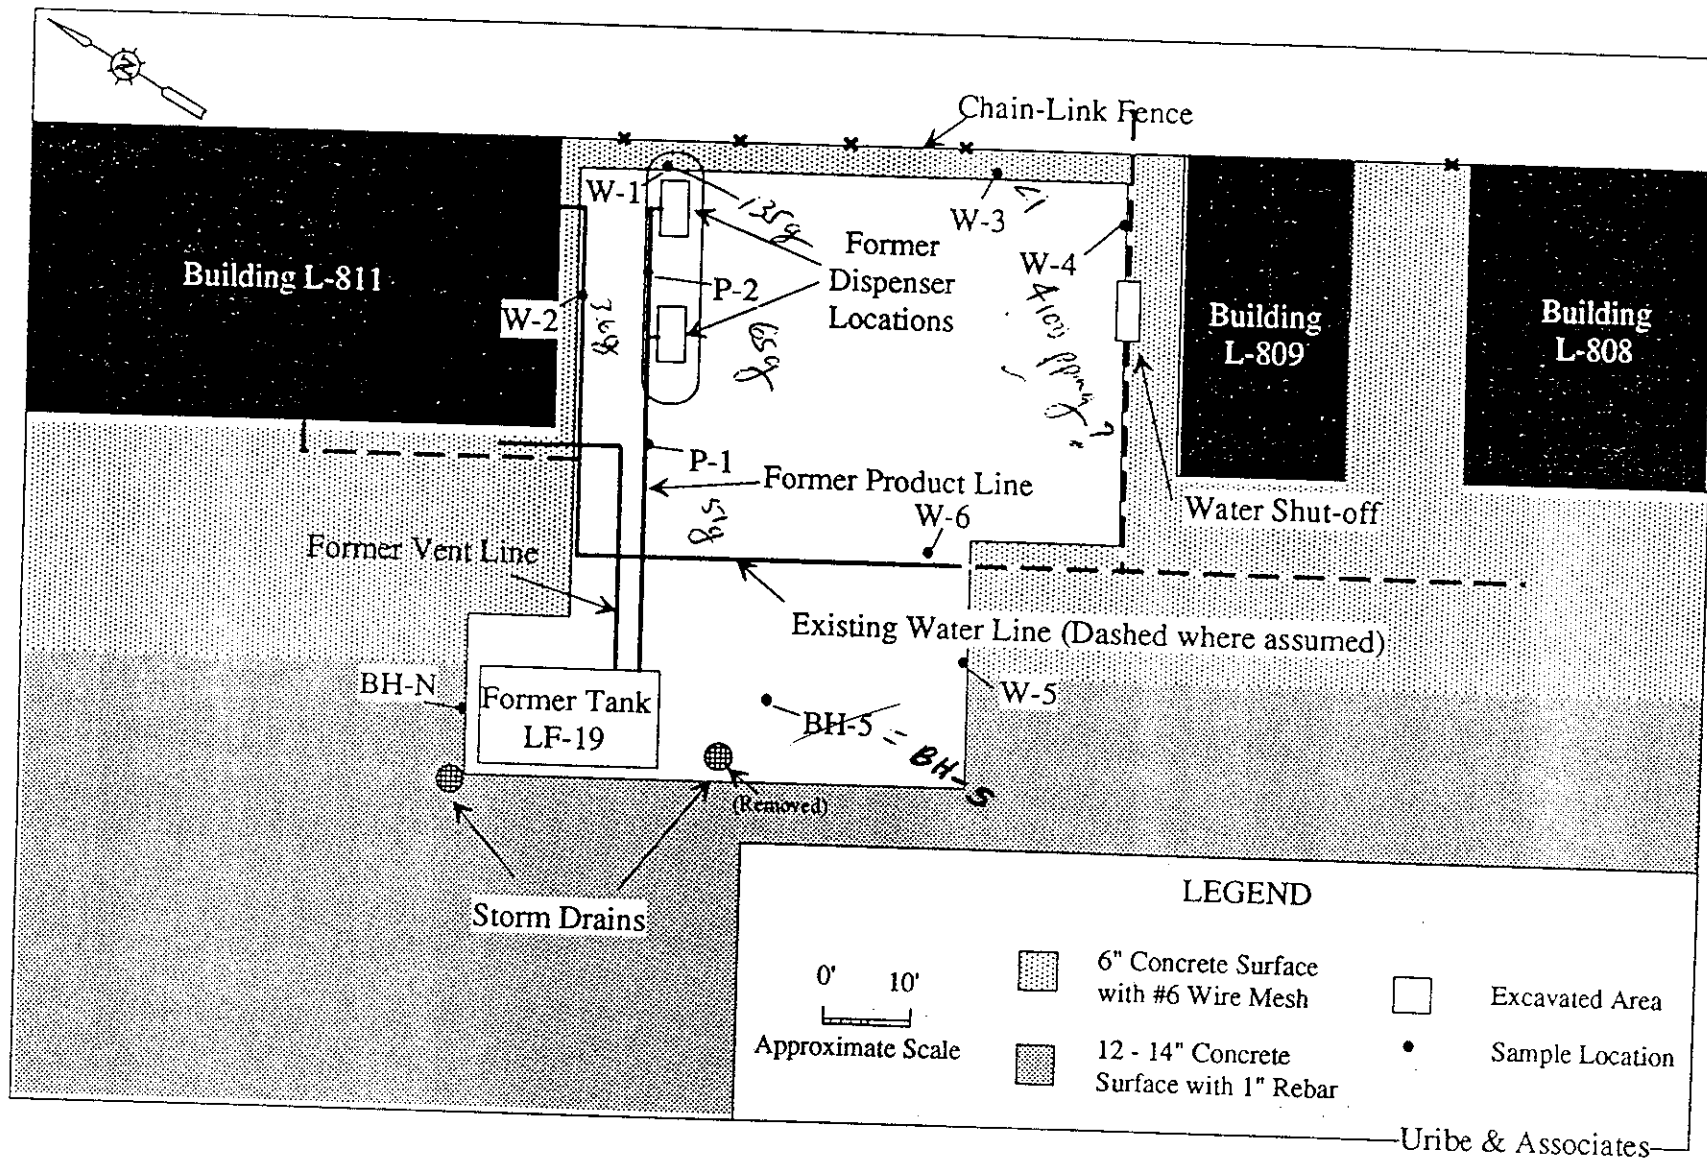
A: Plan View of Sampling Locations and Extent of Excavation at Tank LF-19
